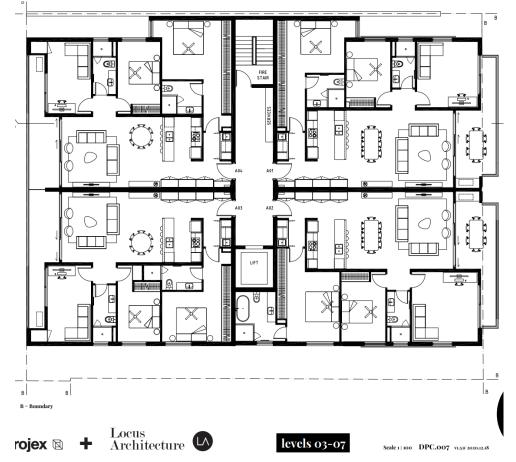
Proposed Varied Floor Plan Levels (3), 4, 5, 6 & 7
